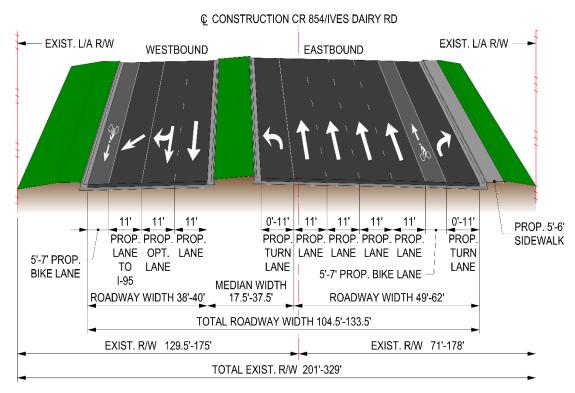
5: Proposed Typical Section - Alternative 1 - CR 854/Ives Dairy Road
